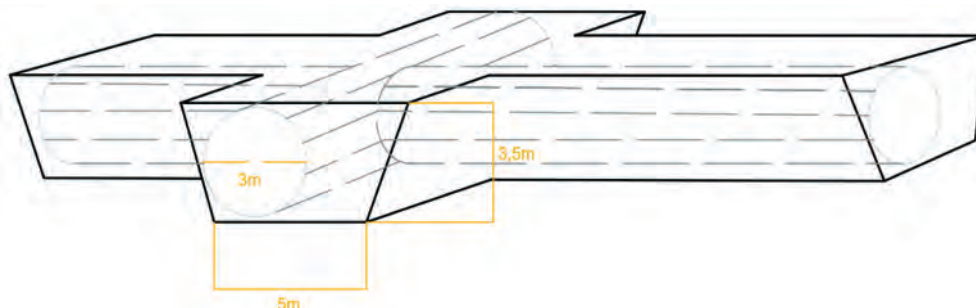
A cutout of KGHM tunnels with installed network pipeline (lower reservoir)
